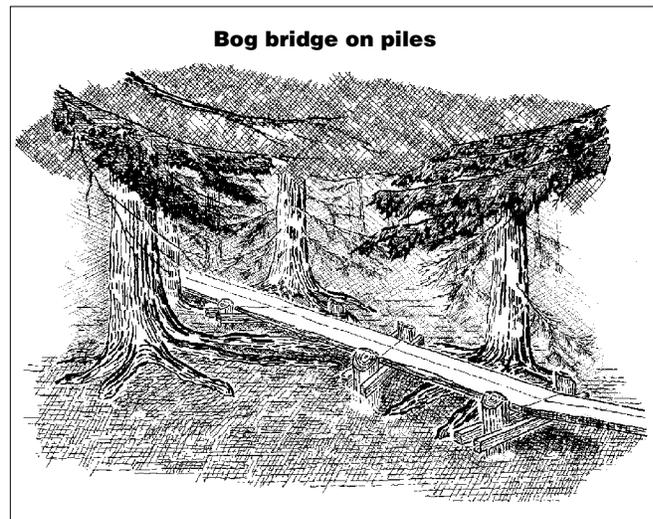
A bog bridge on a pile foundation. Protecting tree roots in a spruce bog requires careful placement of sleepers and piles.
